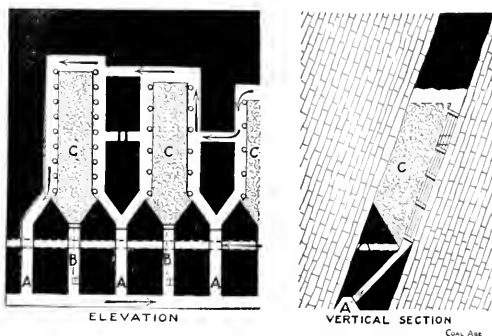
VERTICAL ELEVATION AND CROSS-SECTION OF CHAMBERS AND CHUTES
